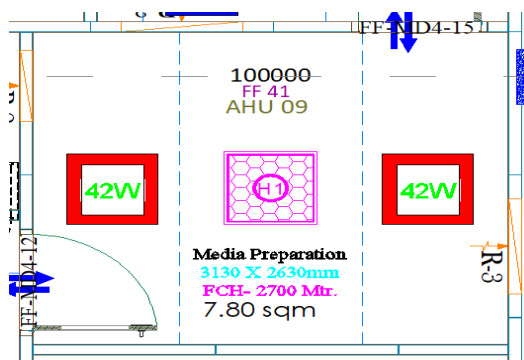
Lighting Layout for Media Preparation Room with Bottom Opening Cleanroom Luminaire
